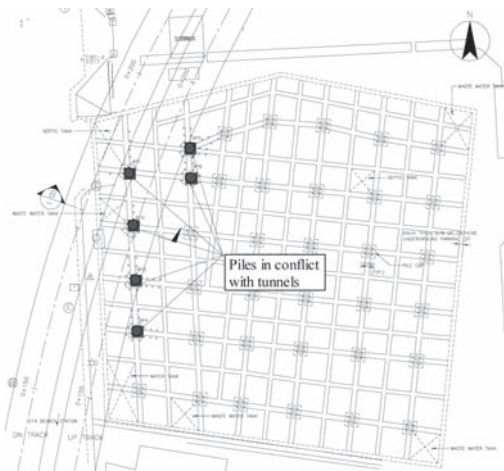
Plan view of underground parking lot and conflicted tunnels.
